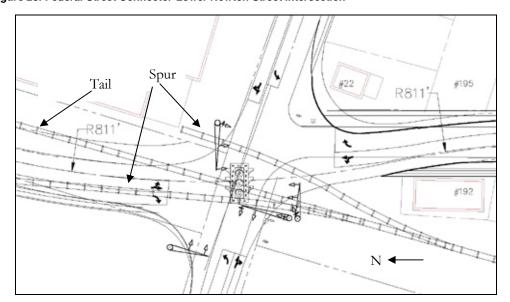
Federal Street Connector-Lower Newton Street Intersection
